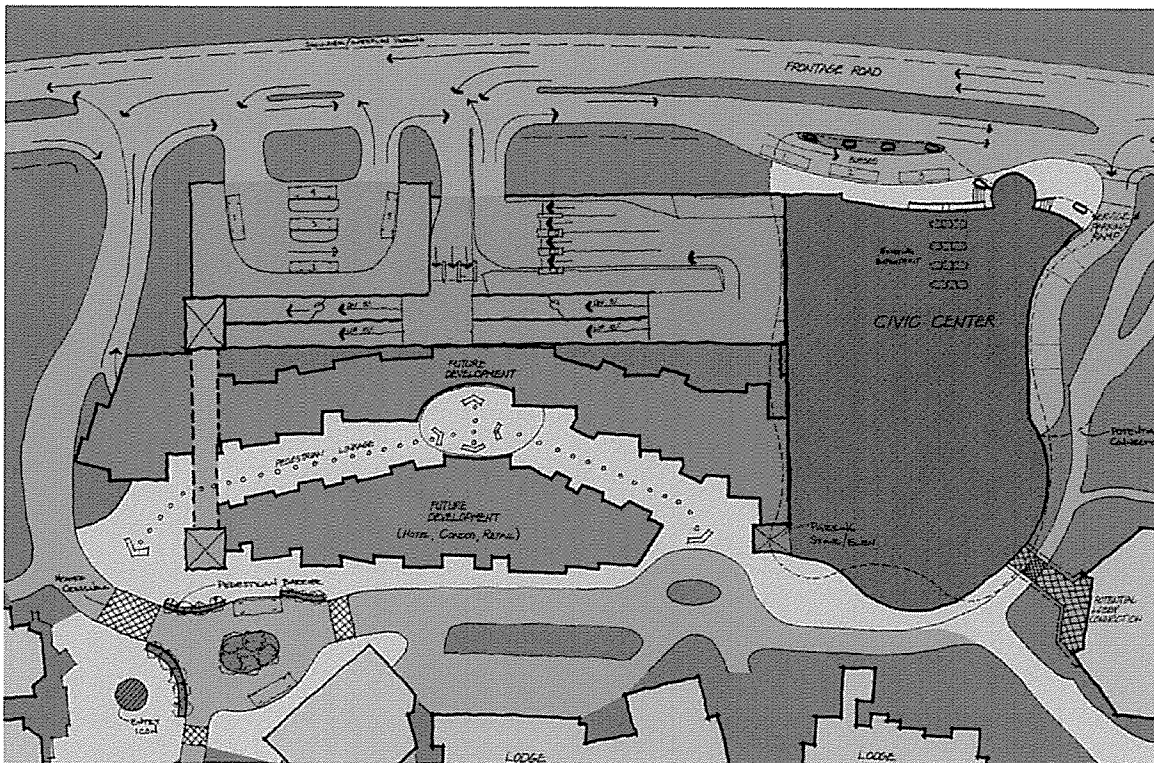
Lionshead Parking Structure Site (Concept Schematic)
